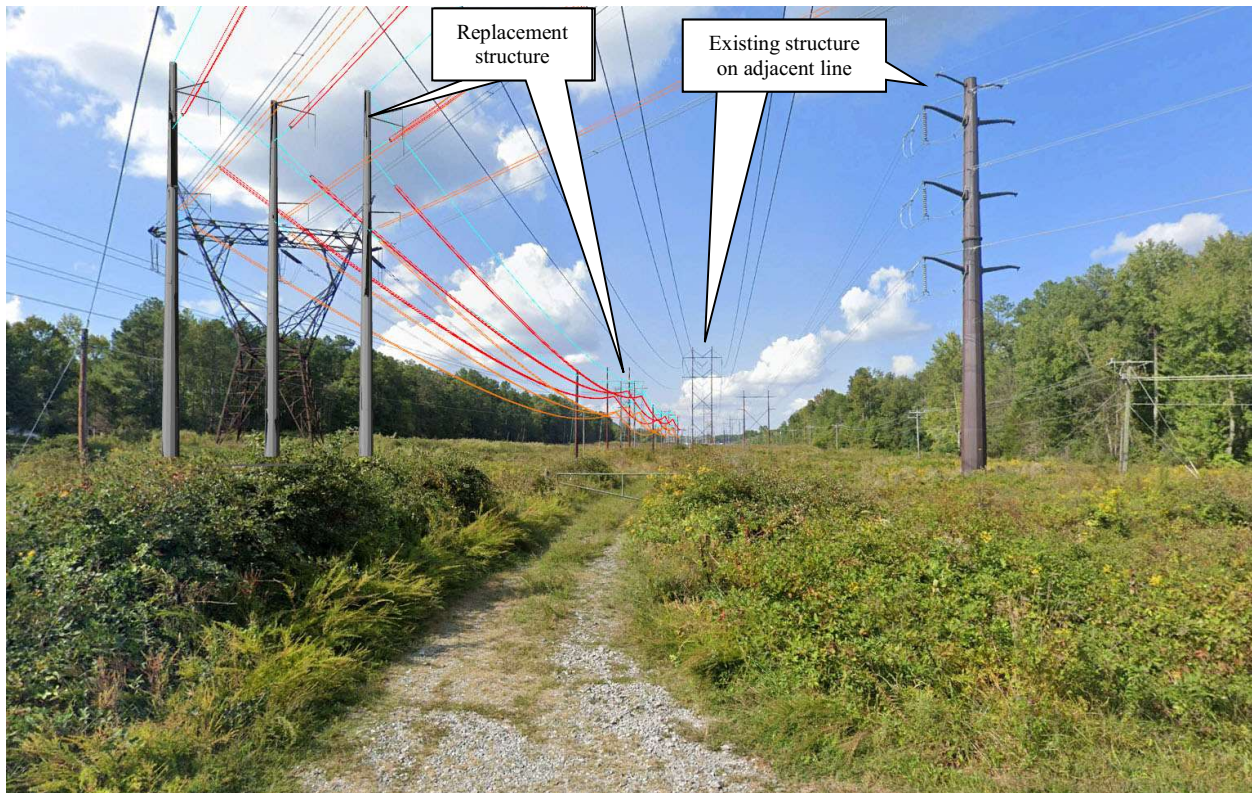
Rendering 1 - model of proposed structures and transmission line from Holly Hill Road at trolley line and project ROW crossing, facing north (new 3-pole structure and H-frame structure visible next to other taller structures in shared ROW). Source: Google Streetview
